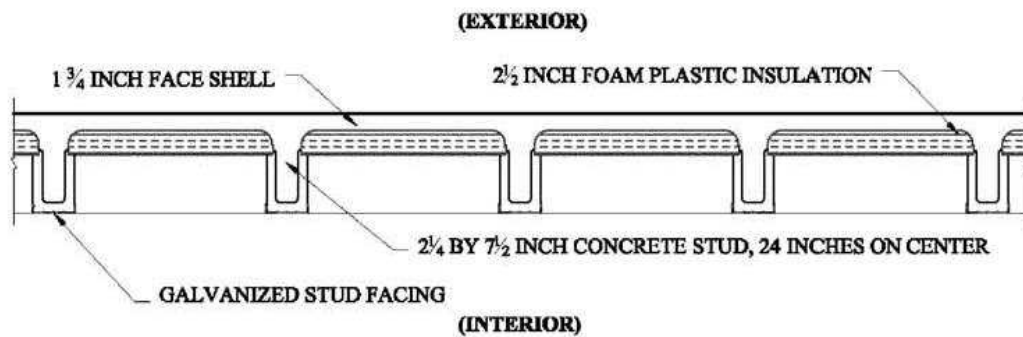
TYPICAL SUPERIOR WALL HORIZONTAL SECTION DETAIL
